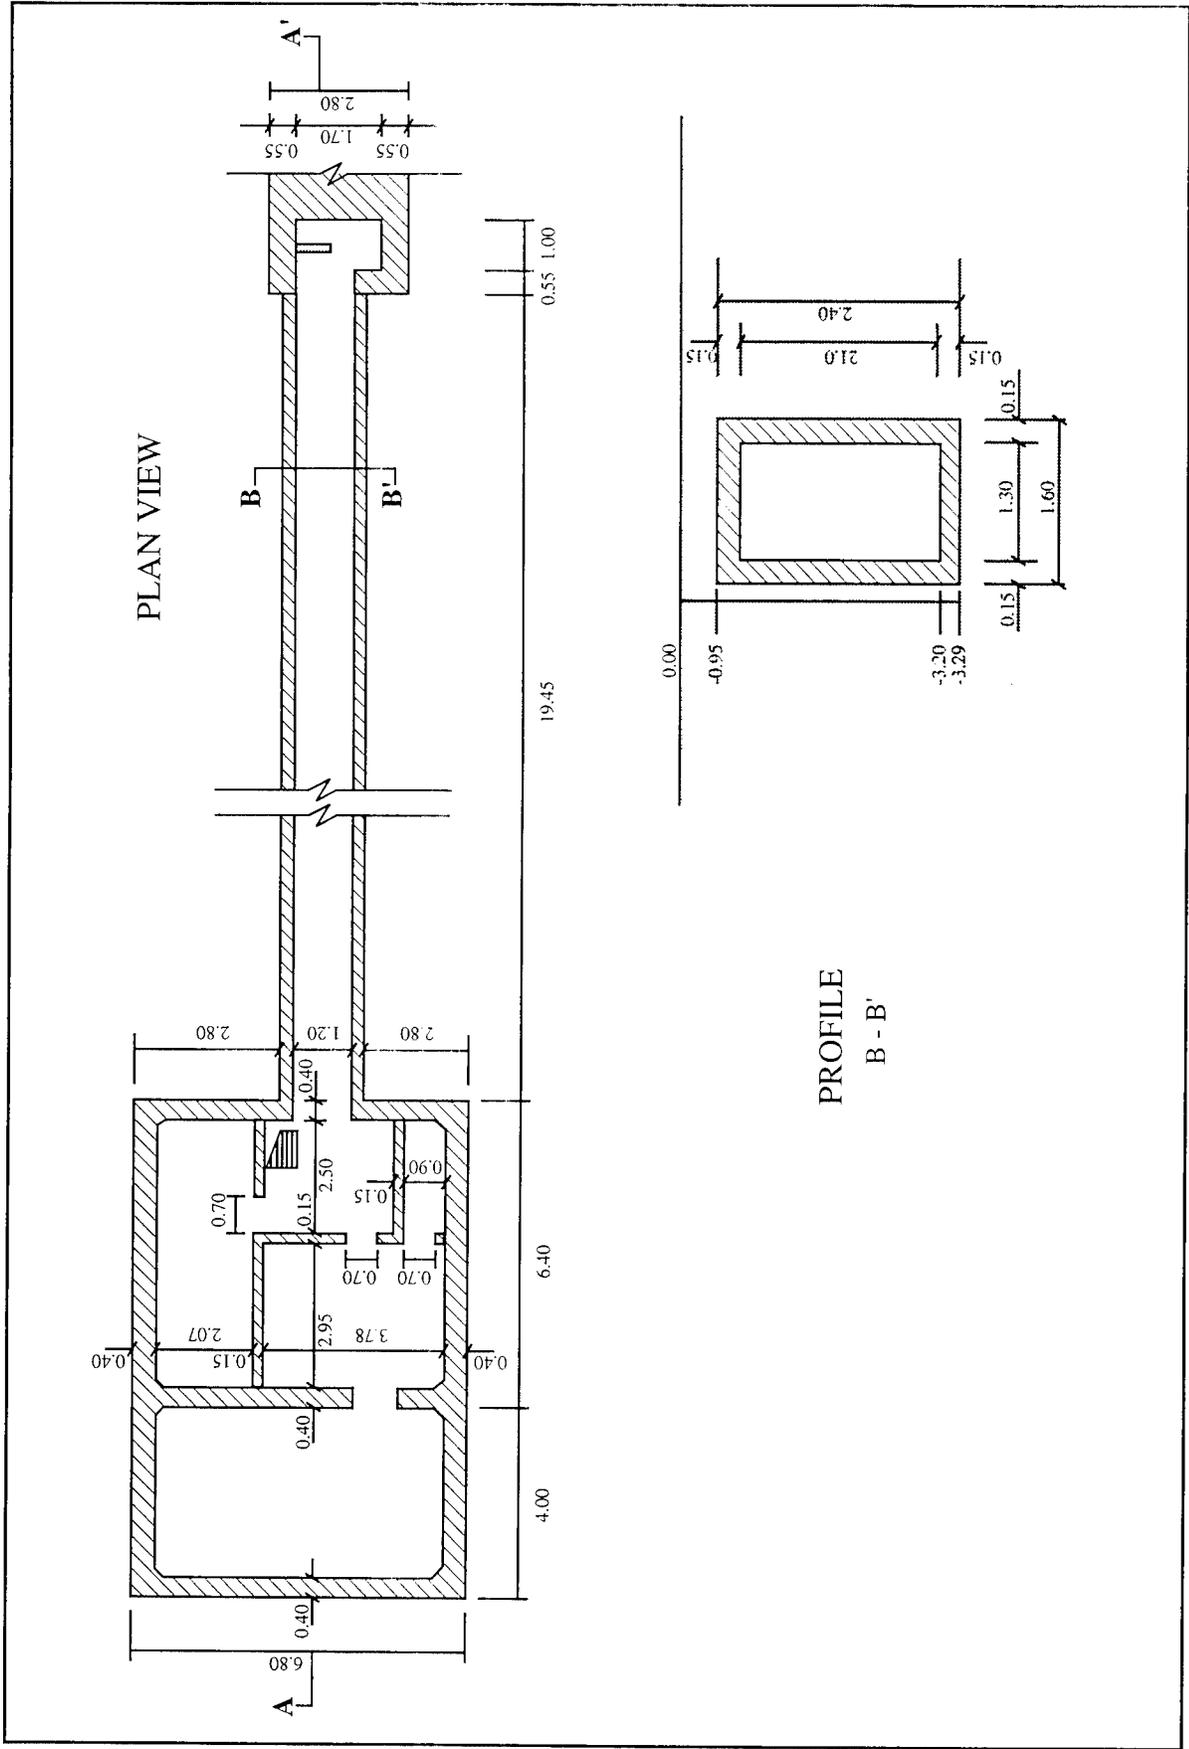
Plan drawing of the "Force Protection" guard house, and associated tunnel and entry structures. Derzhavinsk, Regiment 2, Silo 3. All measurements are in meters.
